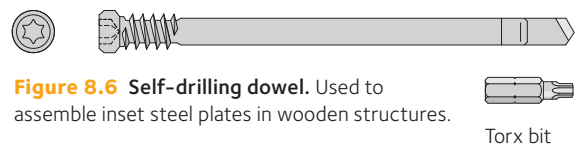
Self-drilling dowel. Used to assemble inset steel plates in wooden structures.
